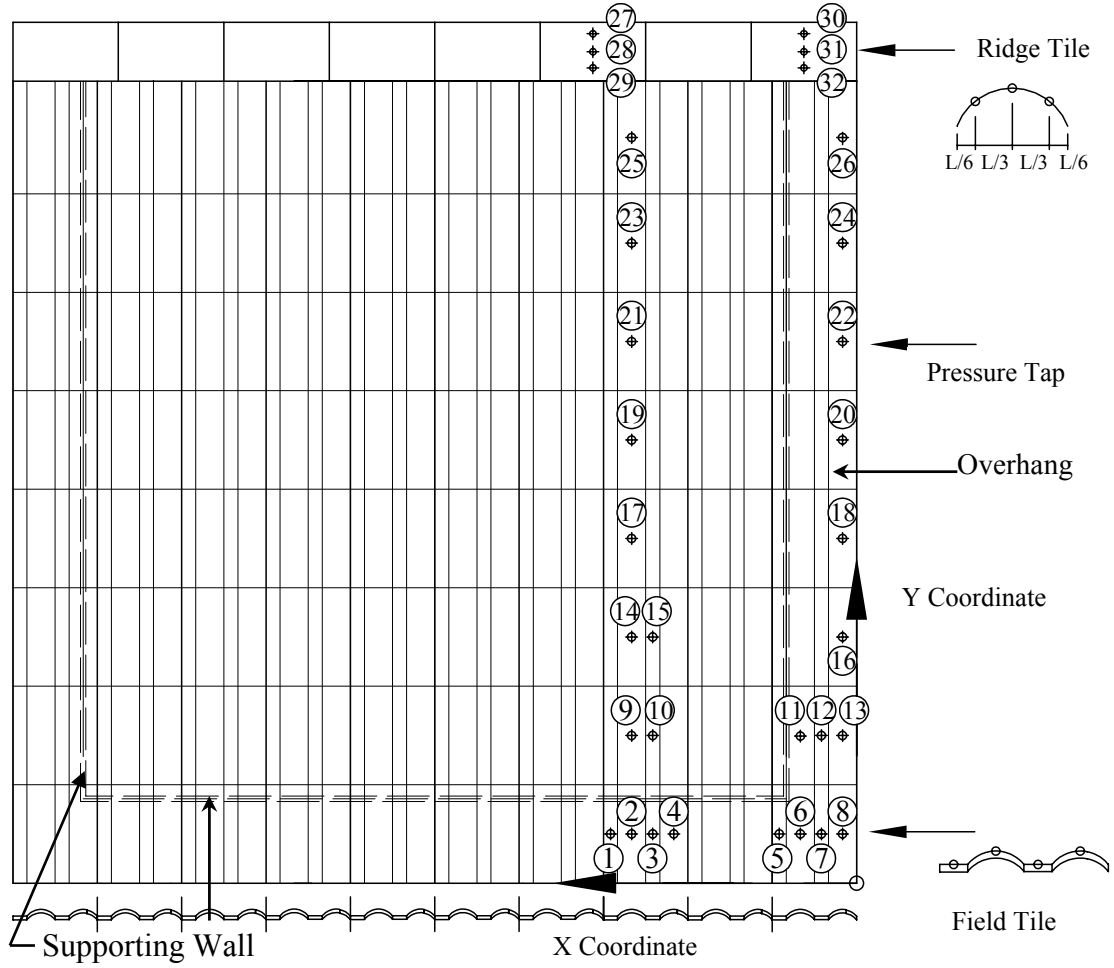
Pressure Taps Layout for Concrete Tile Roofs
